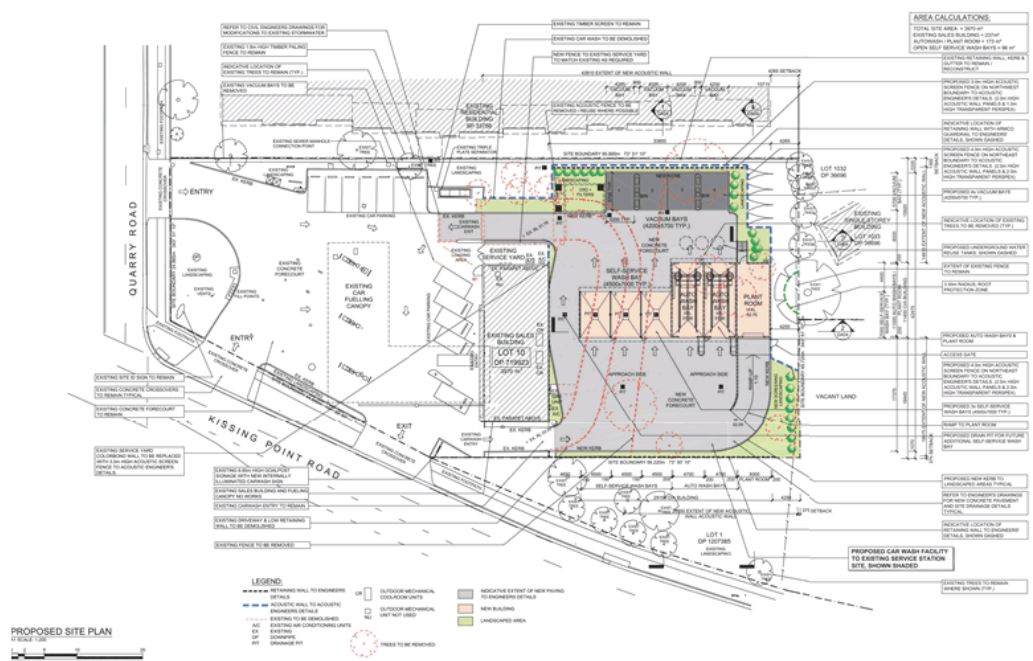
Proposed site plan by MCHP Architects dated 02/09/2020
